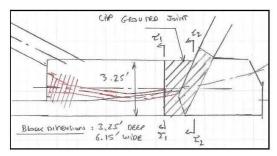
Sketch of bottom block connection between the delta frame and box girder
